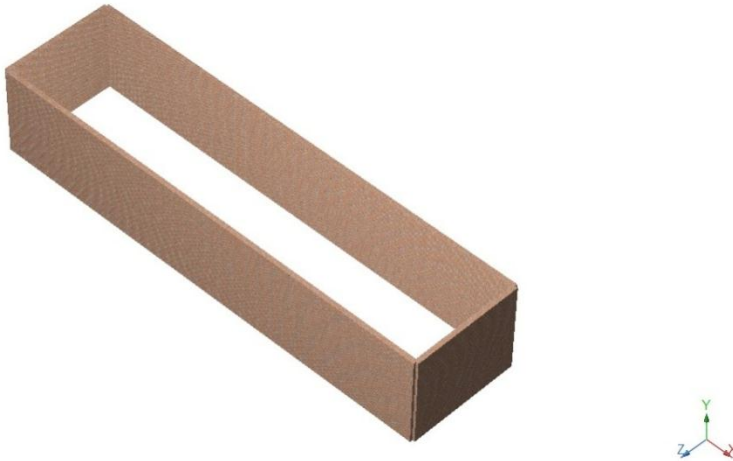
Shows the rendering of the masonry wall in RAM Elements.
